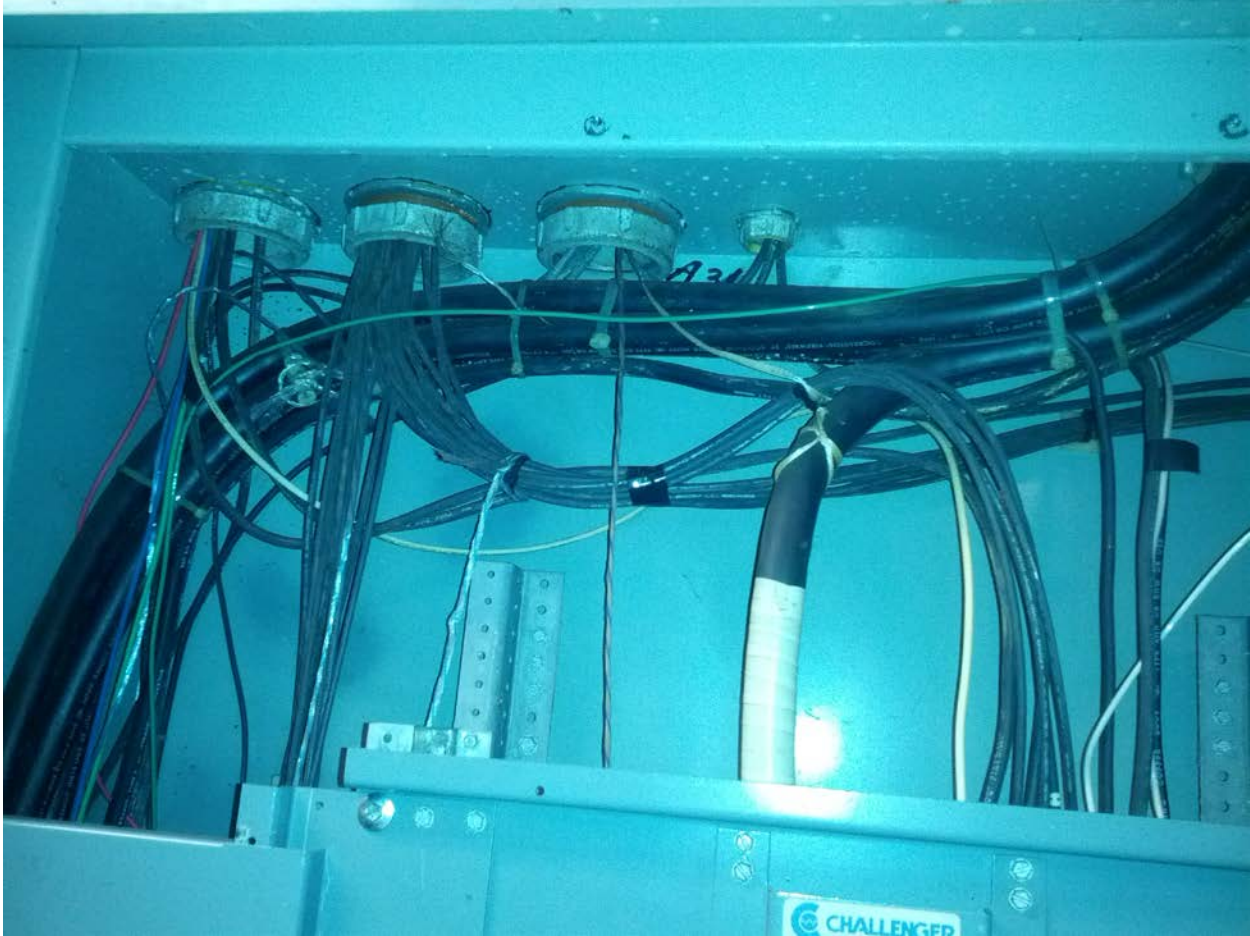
E02 Shaw-Howard U (South) – Junction box and drop to Panel SF in Room 208
